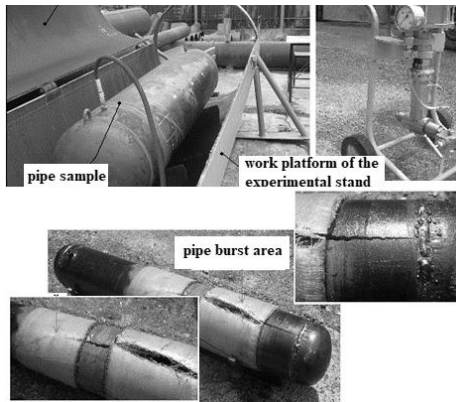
The design scheme and main components of the stand used for internal pressure testing of pipes with local surface defects [1]
